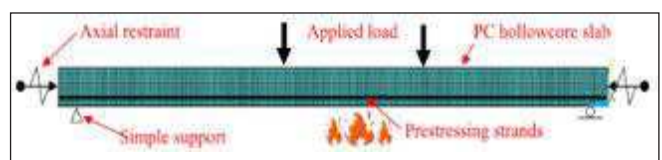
Typical HC slab exposed to fire (Kodur and Shakya, 2017)
